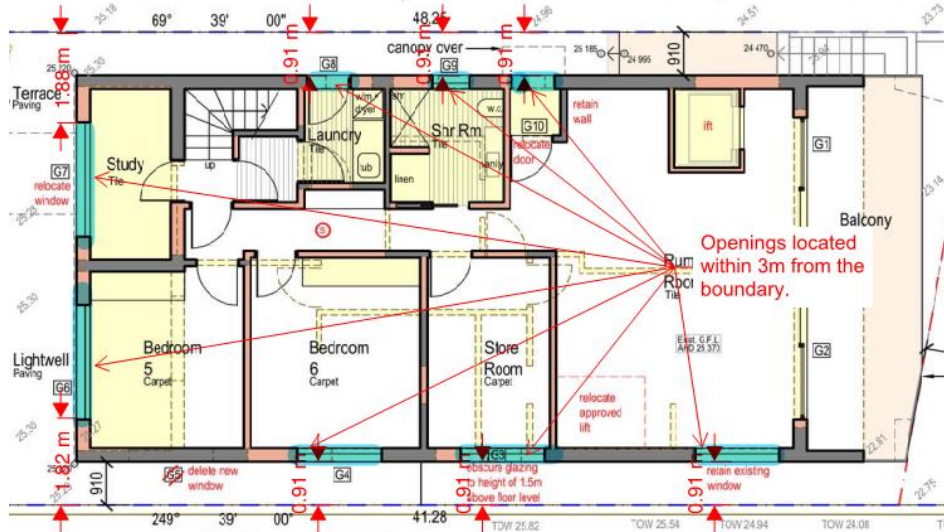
Ground floor openings located within 3m of the allotment boundaries.
